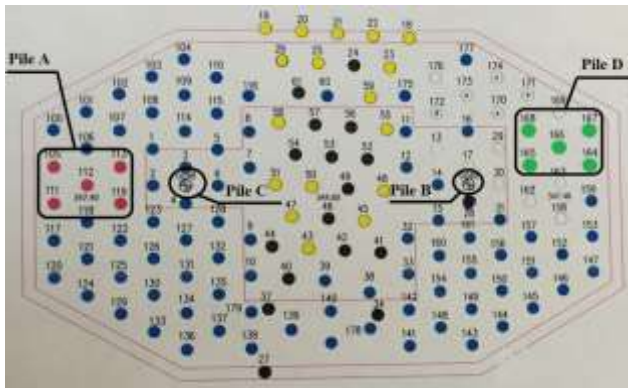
Pile name and test methods in construction site: Pile A -SCLT; Pile B (O-Cell-1); Pile C (O-Cell -2); Pile D (SLT).
